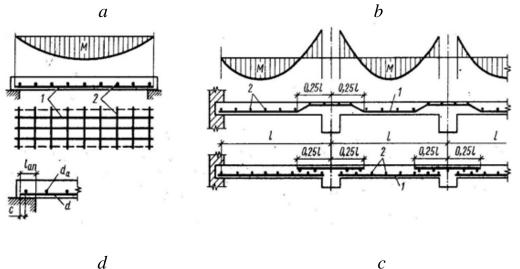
Reinforcement of slabs: a - single-span; b, c - multi-span; d - on a support; 1 – principal and 2 – distribution reinforcement
